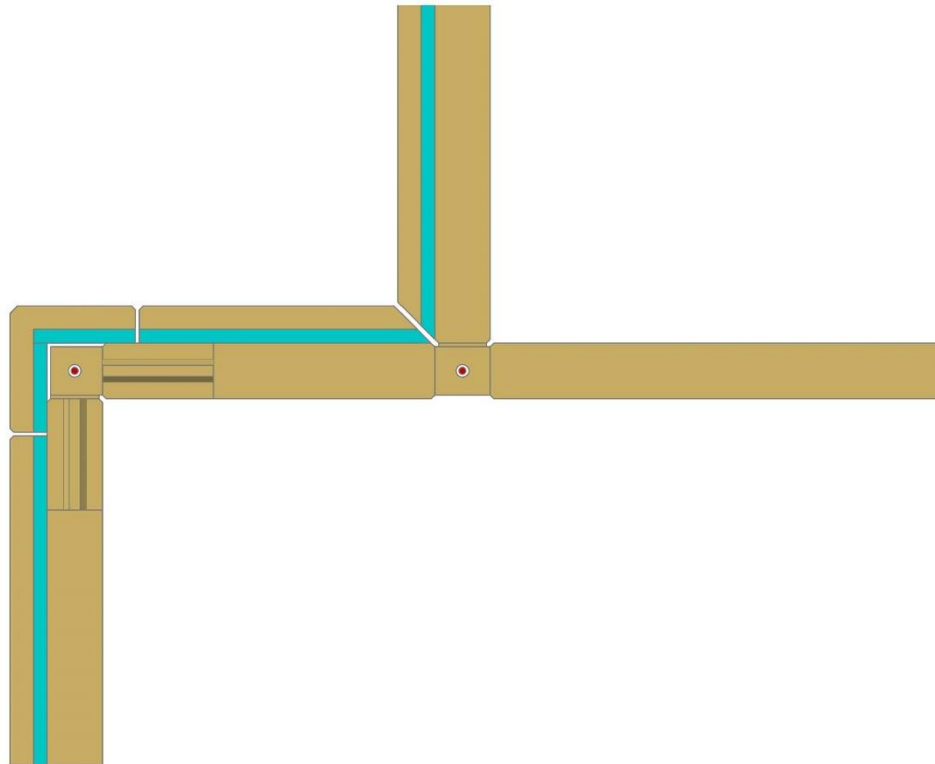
6D-BuildTech PERIMETER WALL BASE DETAIL
